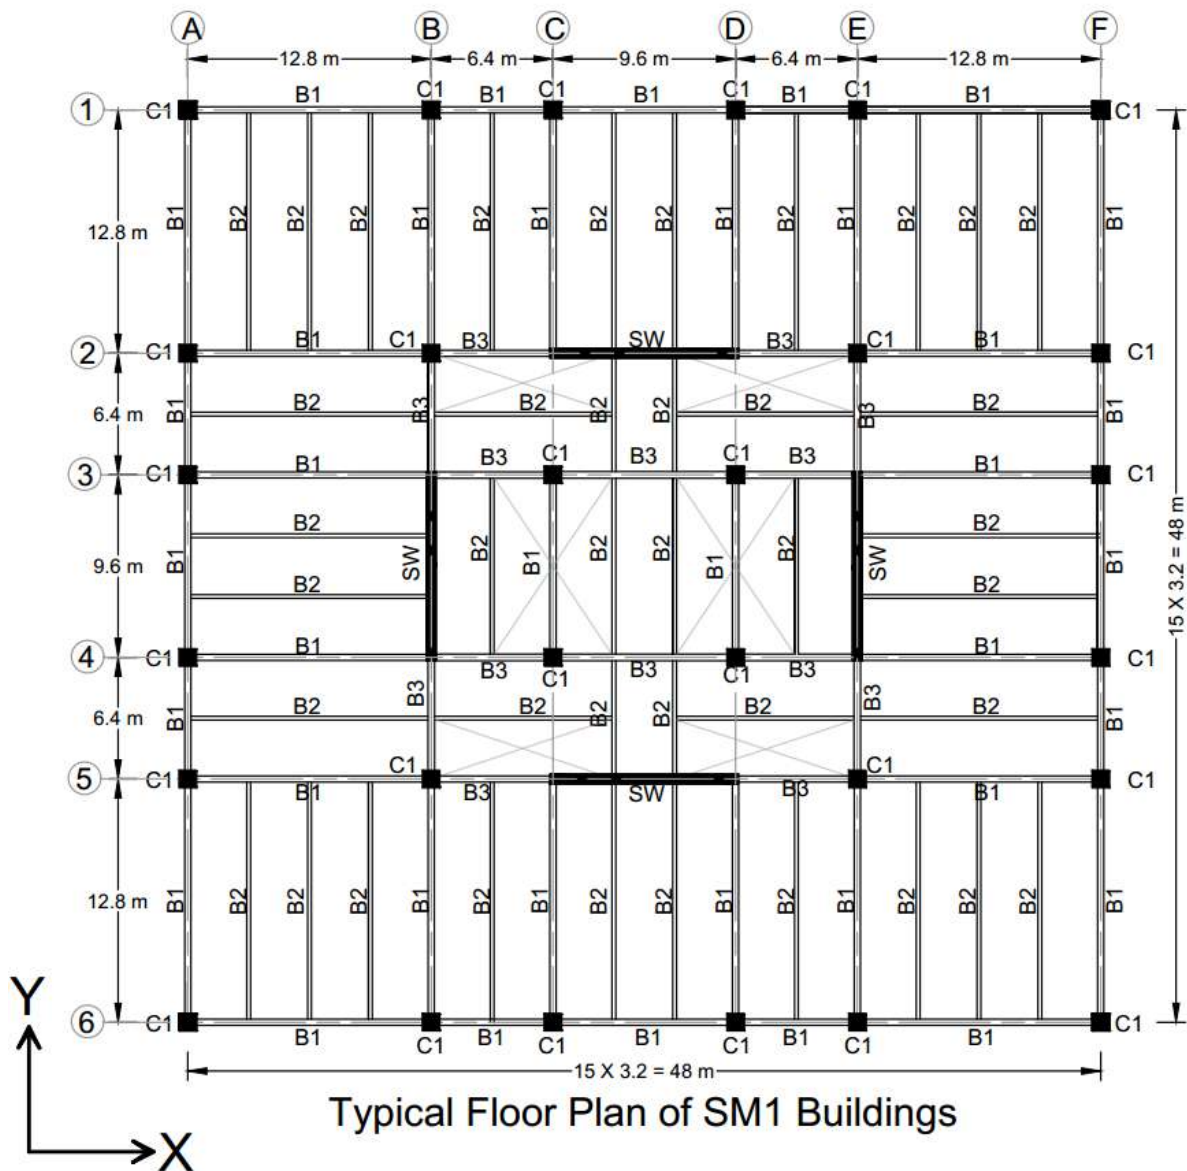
Typical Floor Plan of SM1 Tall Buildings
